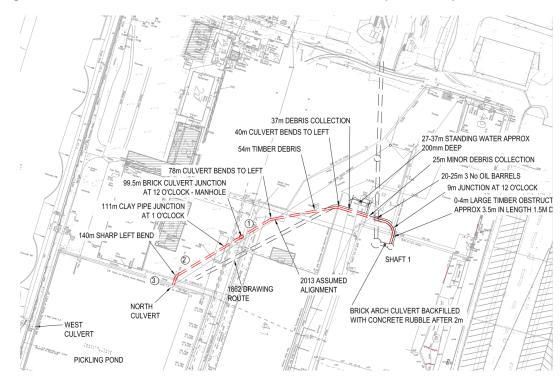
North culvert with location of 3 no. barrels noted (June 2013)
